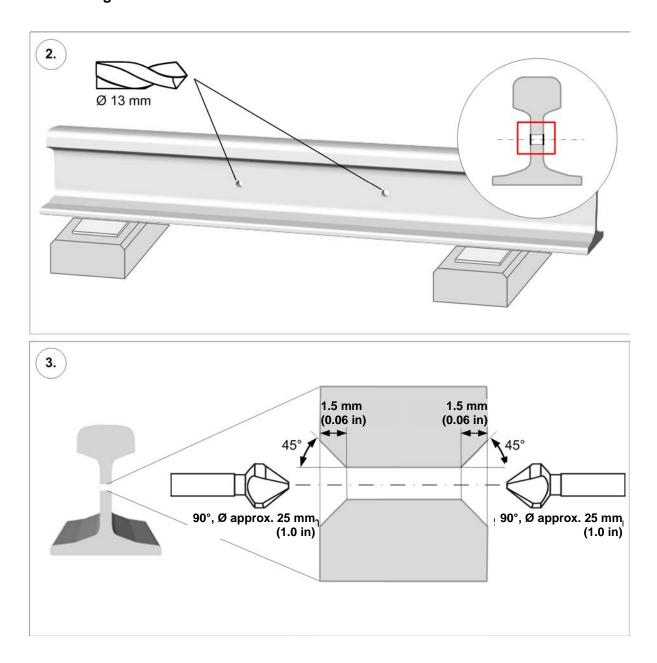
Drilling Rail Web Holes for Outer Wheel Detector
